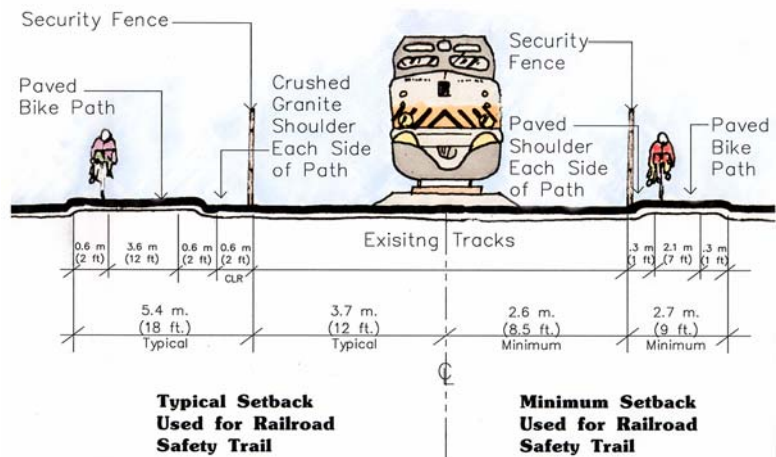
Typical and Minimum Trail Setbacks from Railroad Tracks
